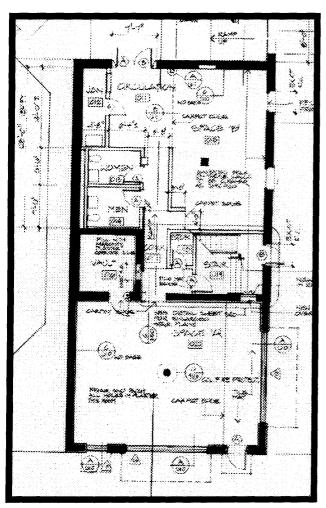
First floor interior plan. North is at the figure top. (Lutes/Sanetel/Architects 1980).
